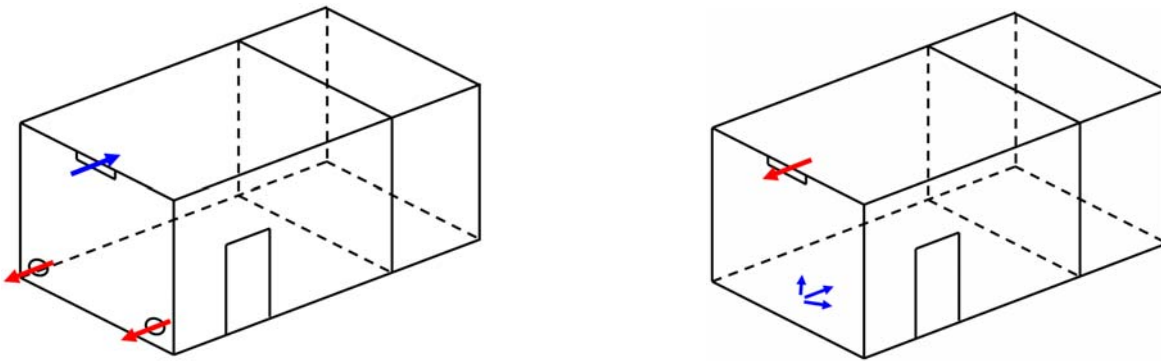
Configurations of the air in- and outlet openings of the test room for mixing (left) and displacement (right) ventilation
